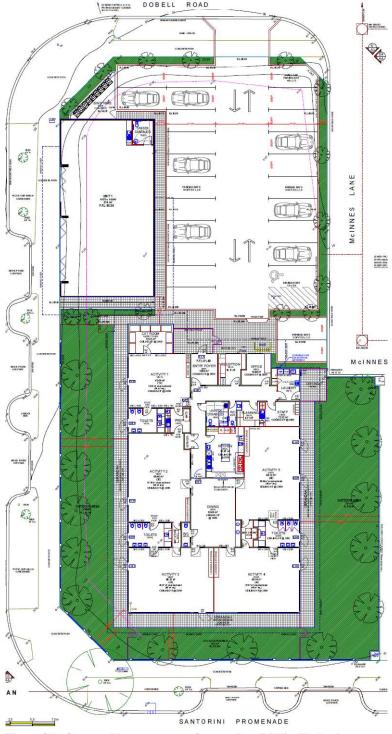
Concept Plan Source: Lou Di Virgilio Designs
